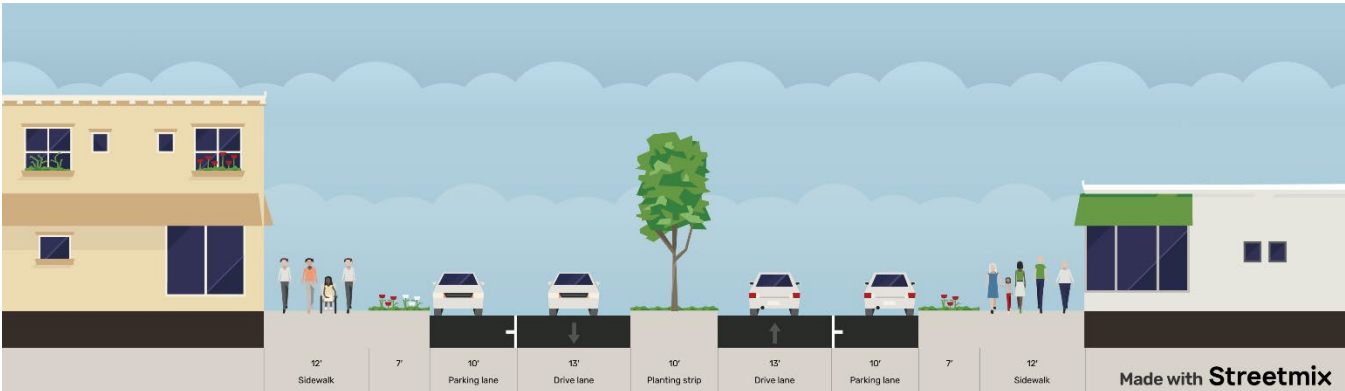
POSSIBLE FUTURE “BIG IDEA” MAIN STREET CROSS SECTION BETWEEN US 40 AND N FRONT STREET
